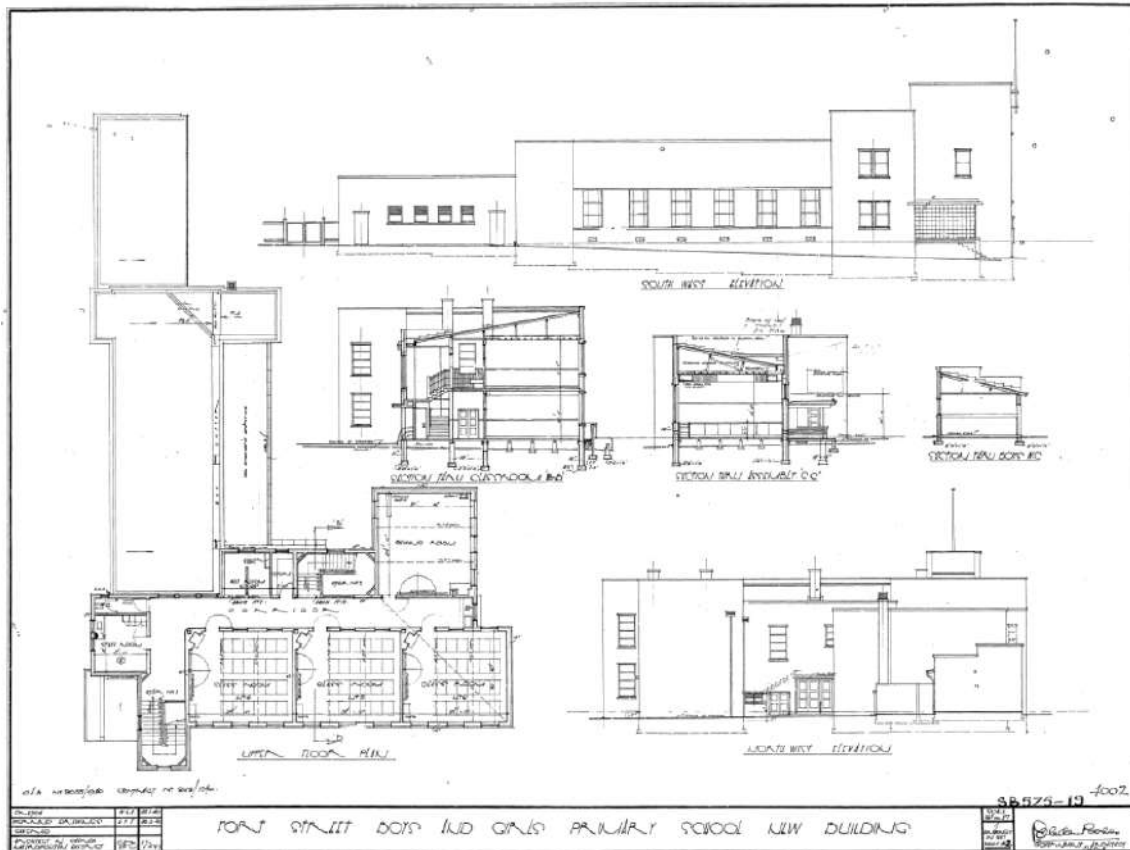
Drawing prepared in the Government Architect's office describing the first floor plan, south west and north west elevations, and cross sections through the building. (Source: Finance & Services Information Services, drawing SB575-19.)
